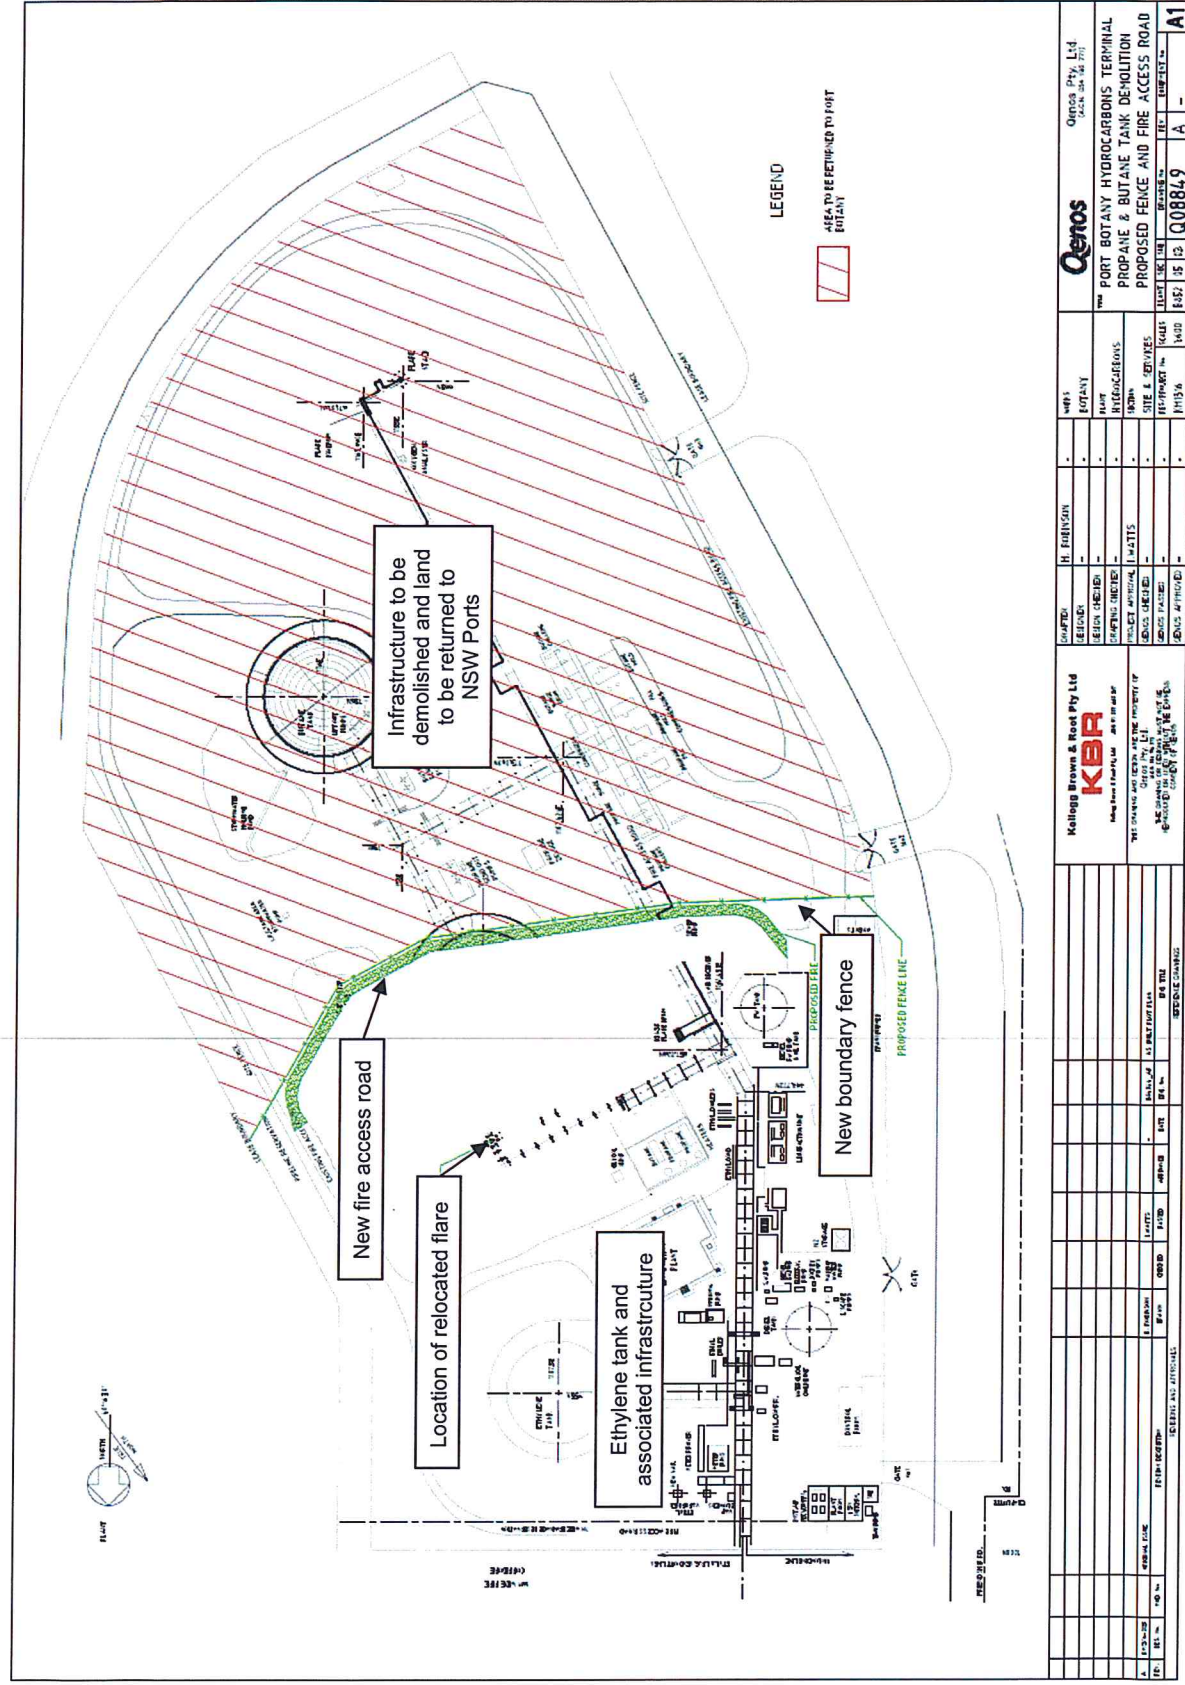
Final Site Plan for Proposed Demolition and Flare Relocation
